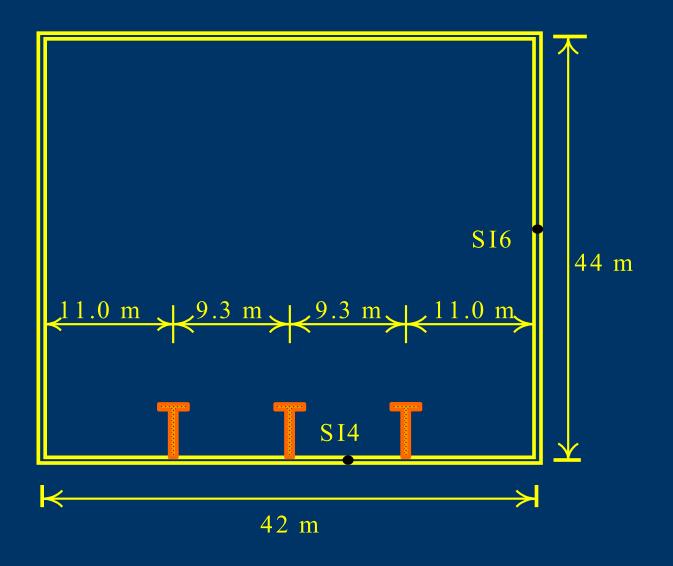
Plan of an excavation with T-counterfort walls
